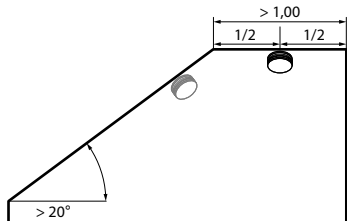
Straight mounting surface at least 1 m long and 1 m wide
